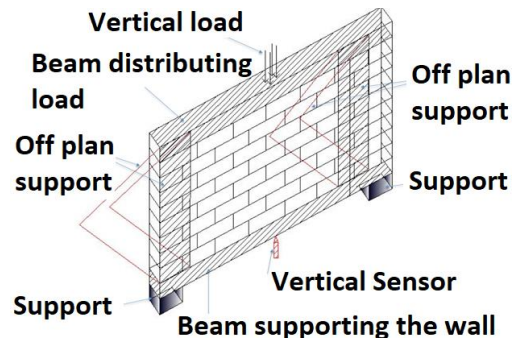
Geometry of masonry walls tested in the bending test and illustration of the wall.
